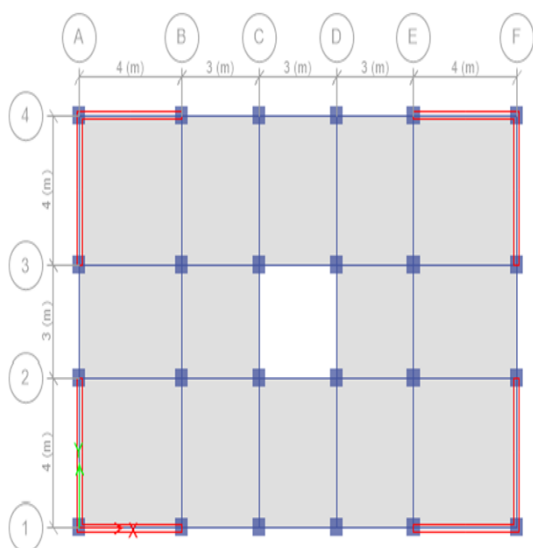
Plan view of the Structure with Shear wall at Corners
